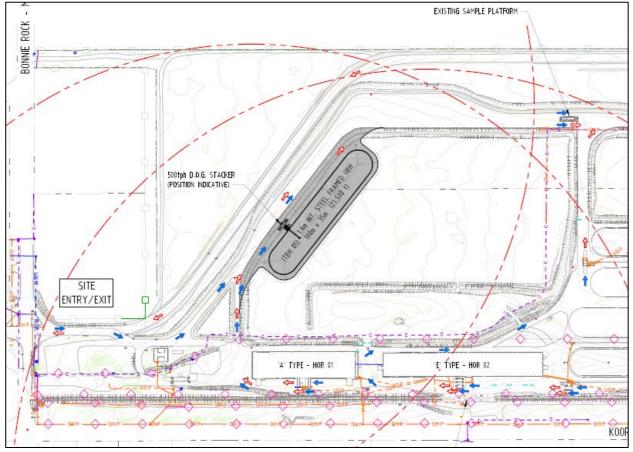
EXTRACT OF DA PLAN OF PROPOSED OPEN BULKHEAD
